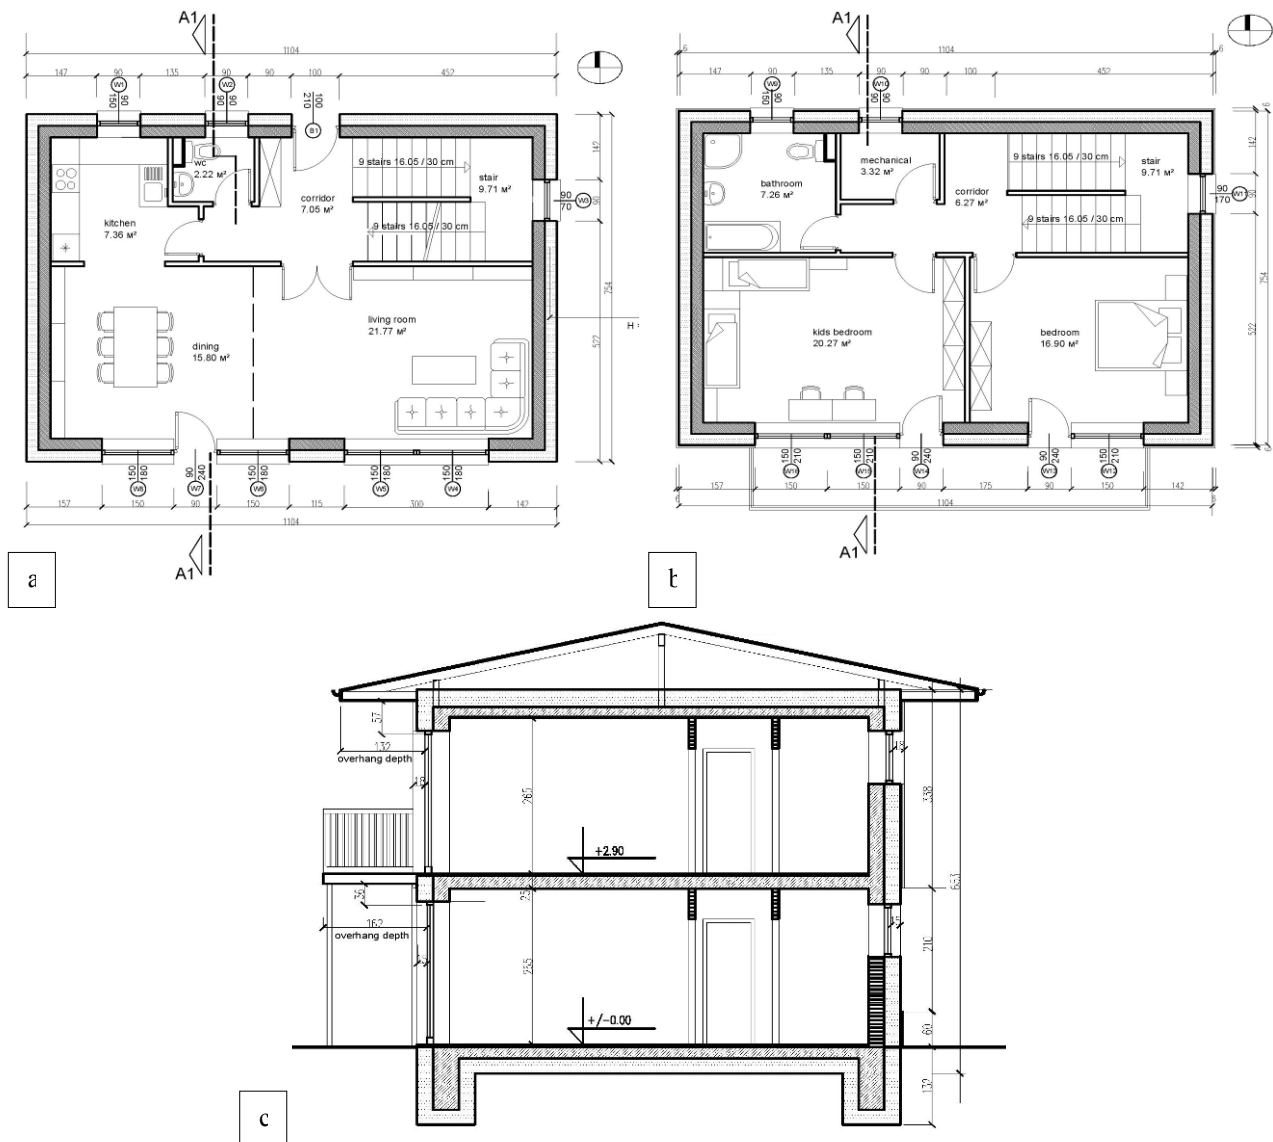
House plans (a) ground floor (b) first floor (c) building section
